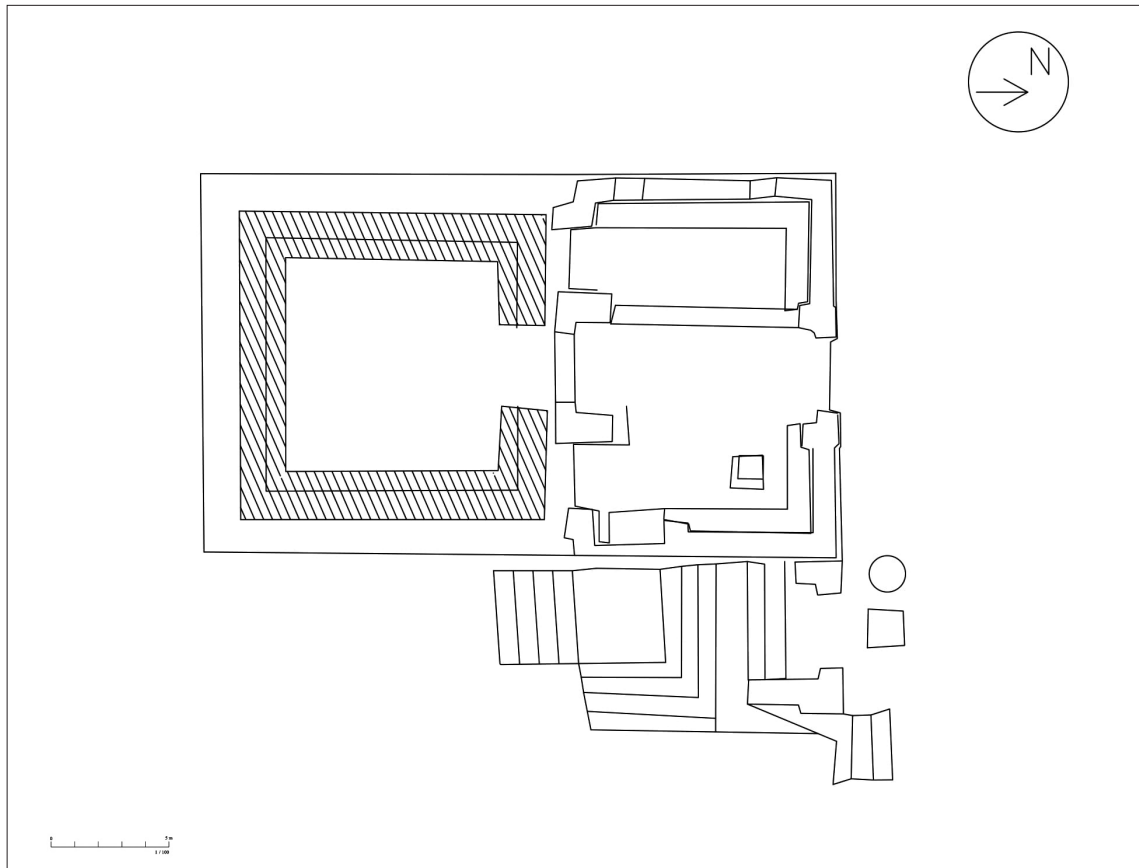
Bir el Shaghala, Tomb 5: superstructure, plan.
